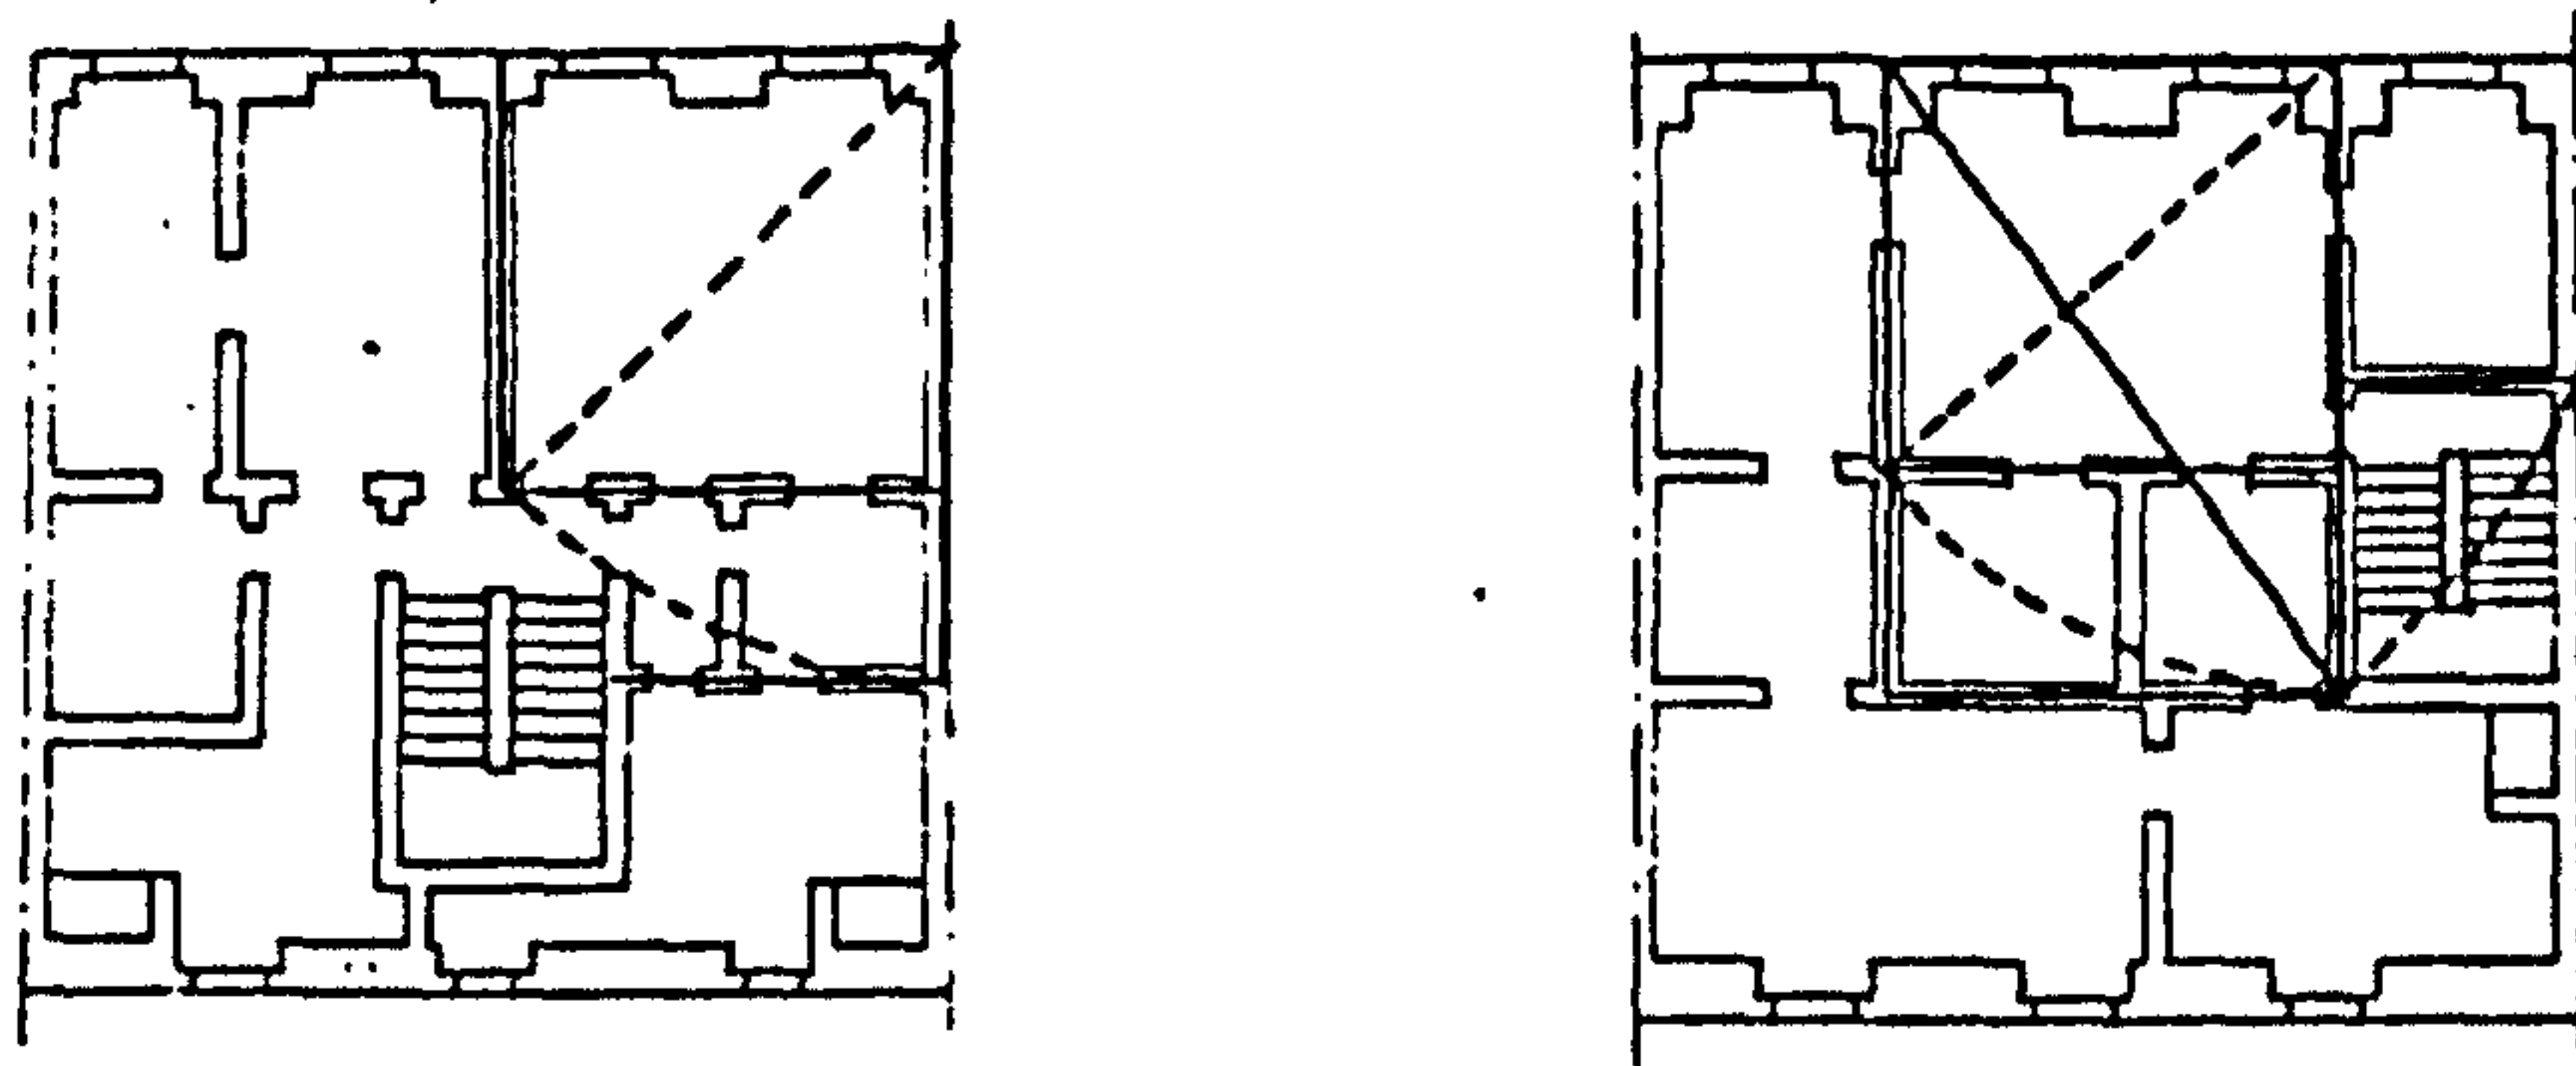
The square rooms behind the street façade define the depth of the second row of rooms: example 2
